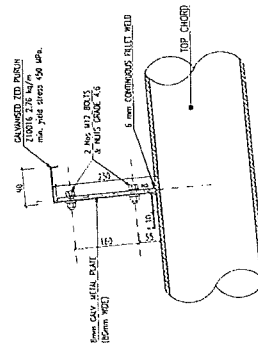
DETAILS OF ANGLE STIFFENER BRIDGING TO PURLINS
